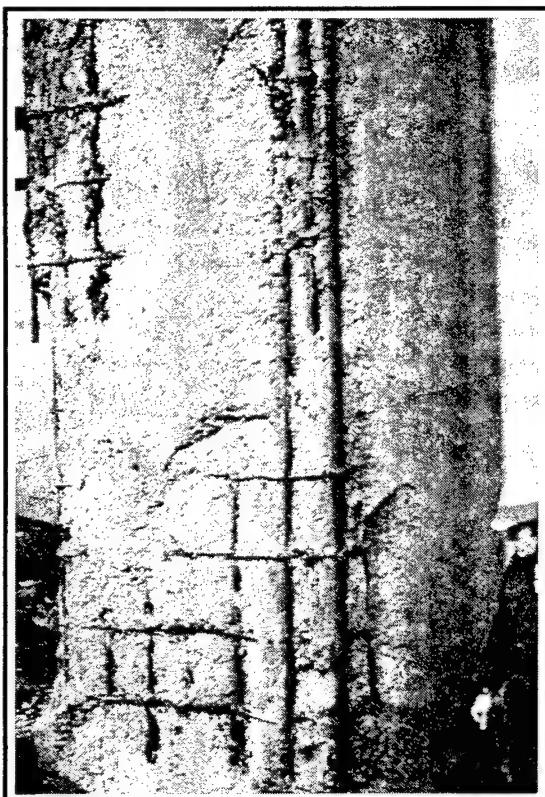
Concrete pile failing due to corrosion of steel reinforcement.
